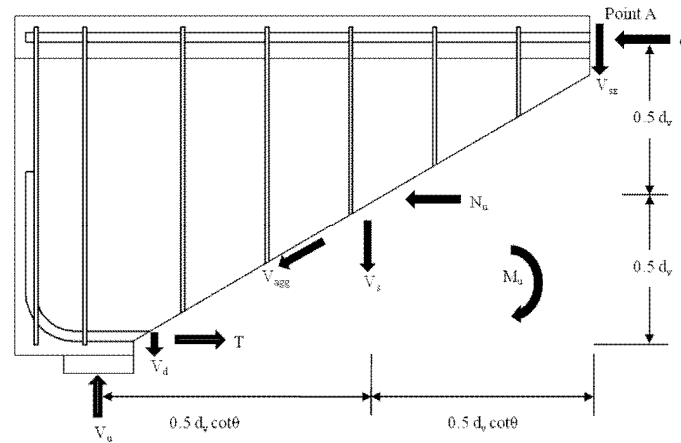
Internal forces in a diagonal cracked reinforced concrete section
